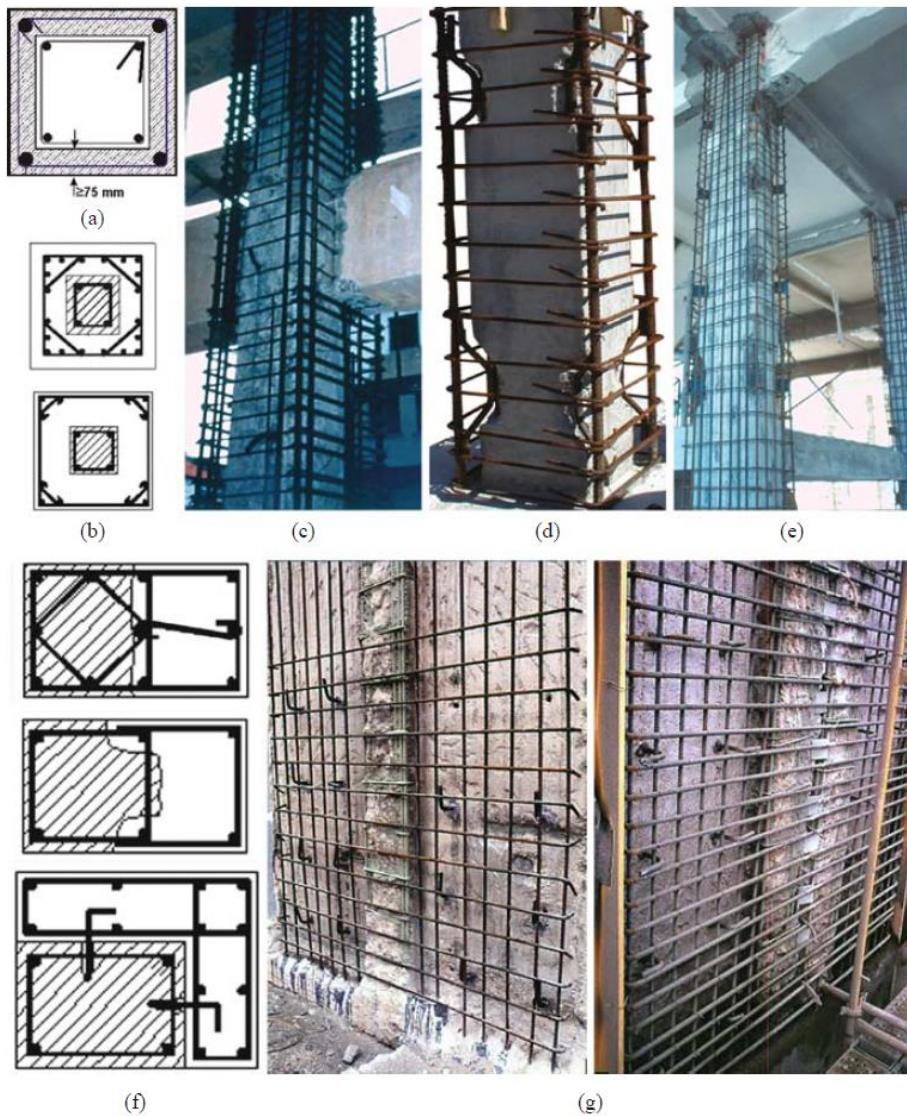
Concrete jackets in columns: a) the simplest case b) jacket bars bundled near corners, engaged by cross-ties or orthogonal tie c) jacket bars bundled at corners, dowels at interface with old column d) U-bars welded to corner bars e) steel plates welded to corner bars f) one- or two-sided jackets g) one-sided concrete overlay with single curtain of two way reinforcement at exterior face of perimeter walls, (M,Fardis[12])
